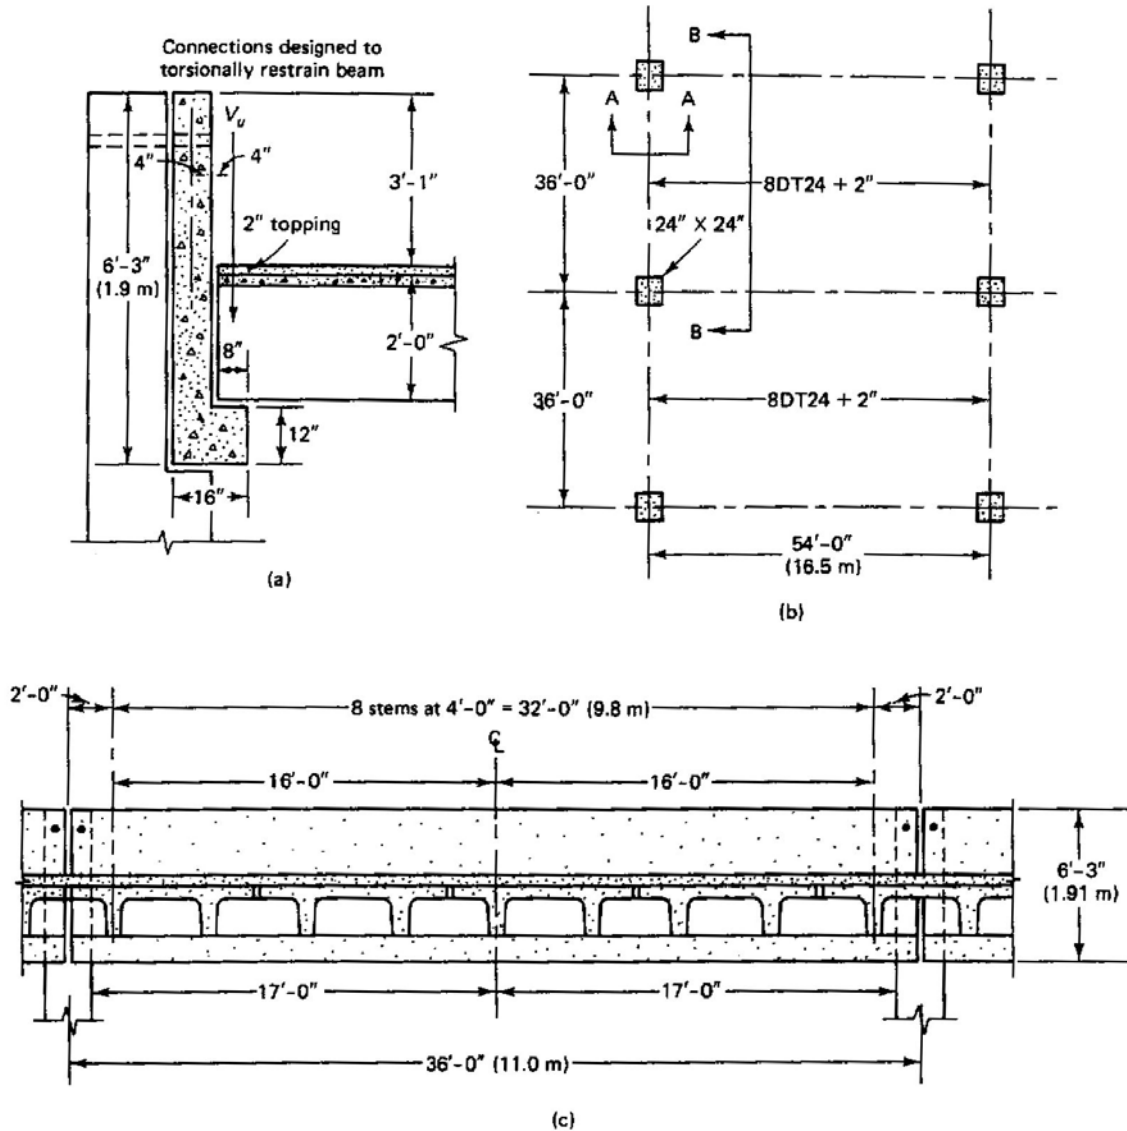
Geometrical details of structure in Example 5.9. (a) Section A-A. (b) Partial plan. (c) Section B-B.
